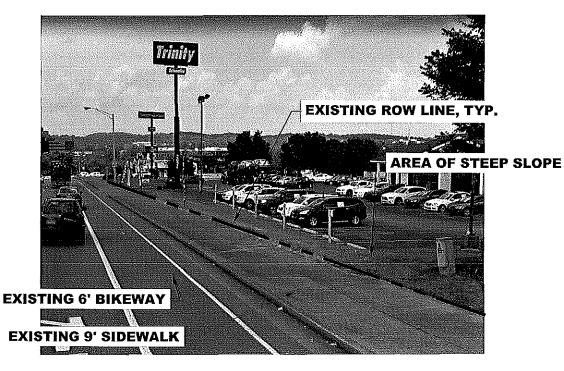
NORTH ALONG ROSA L PARKS BLVD
